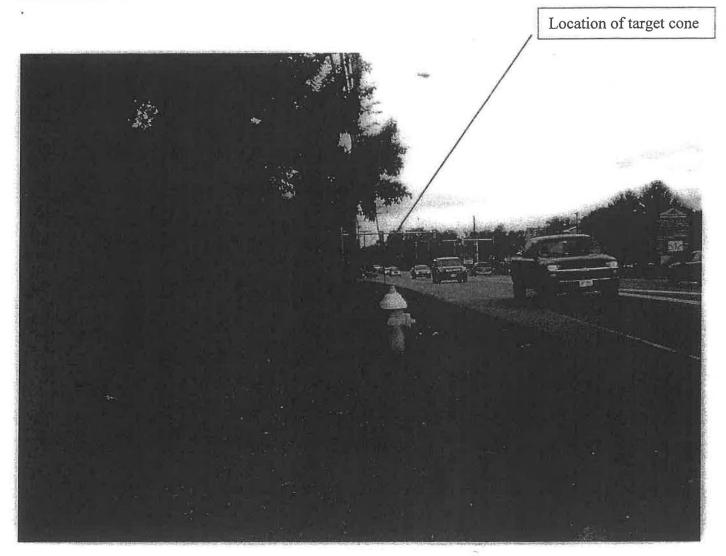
Sight distance looking north along Lowell Road toward a traffic cone, placed 400' away.
